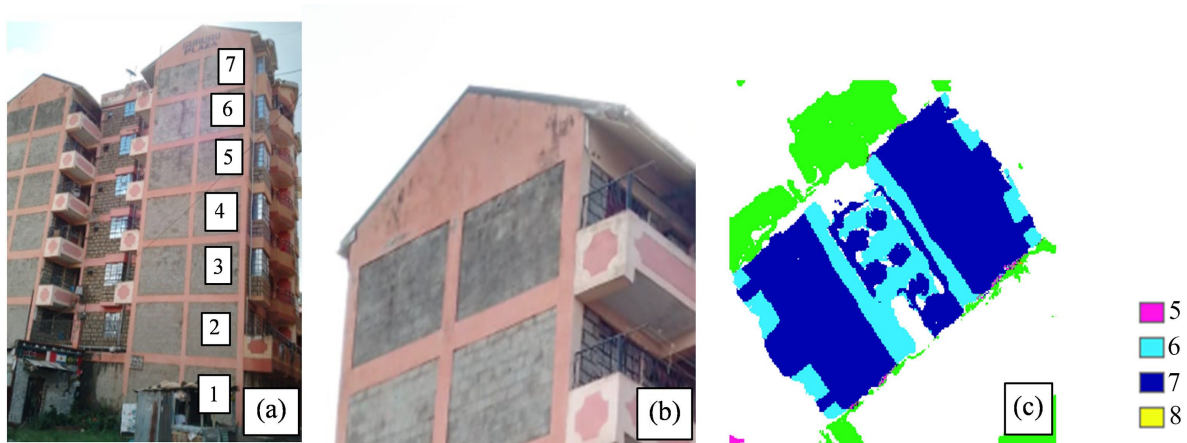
(a) Building with seven floors, (b) zoomed side view of the top of the building, (c) the colour on floor numbers indicate the building to have a maximum of seven.
